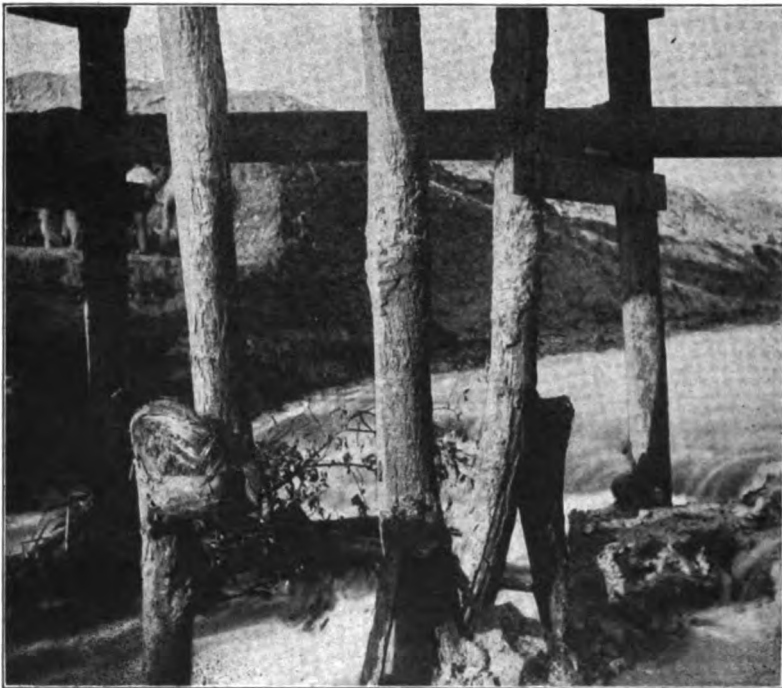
OVERDRIVEN PILES IN TEMPORARY CONSTRUCTION FOR A HIGHWAY BRIDGE, NEAR DANVILLE, ILLINOIS.
